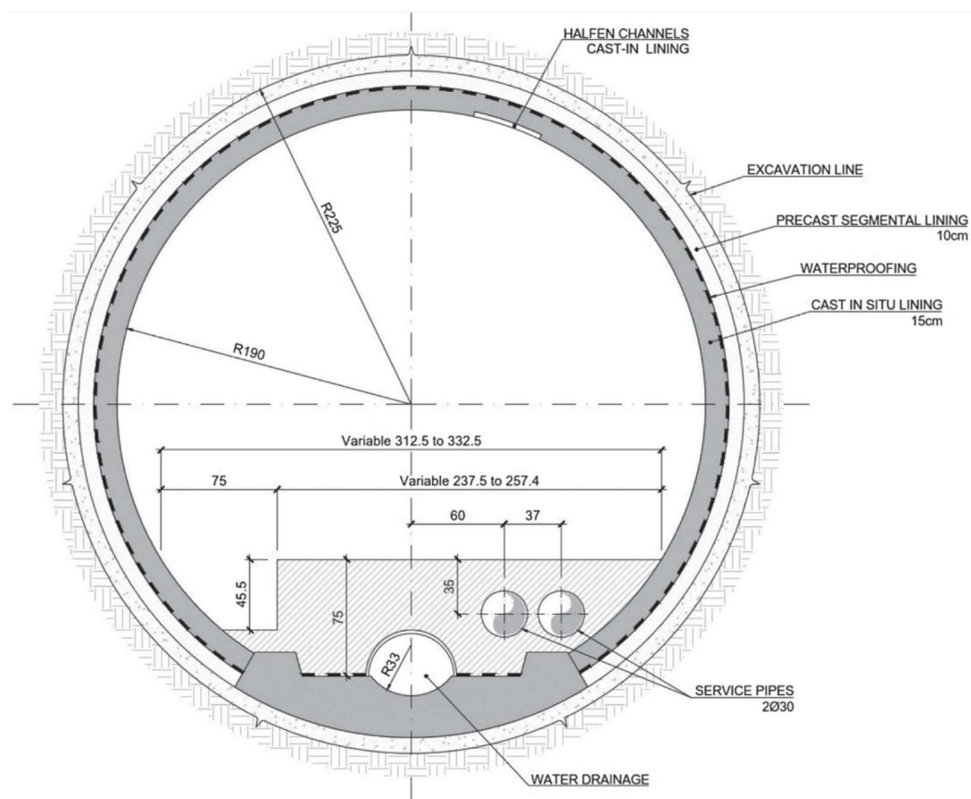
3 Typical cross-section of LHC tunnel (Abada et al., 2019)
